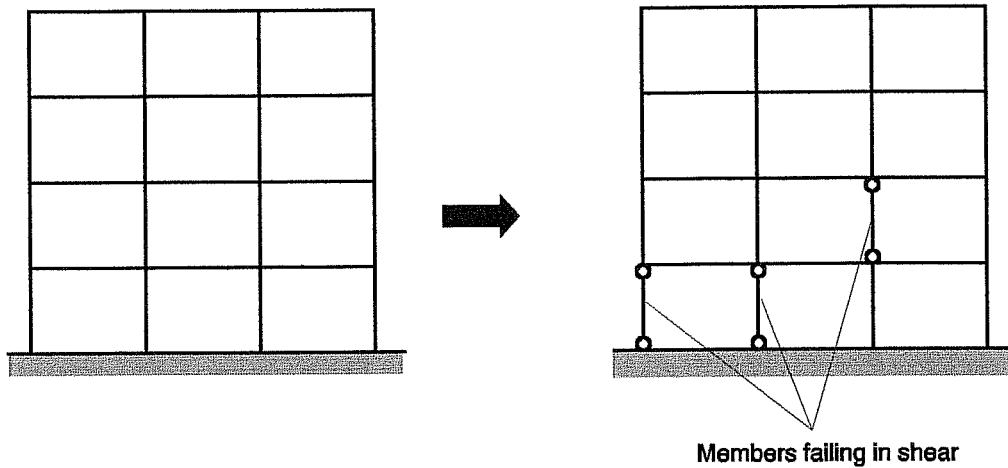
Simplified model of reinforced concrete members failing in shear.
